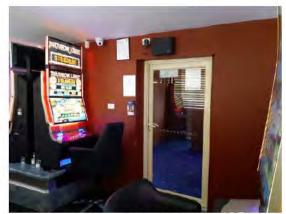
| Modern outdoor gaming room, looking E. Door to be removed and made wall made good.
